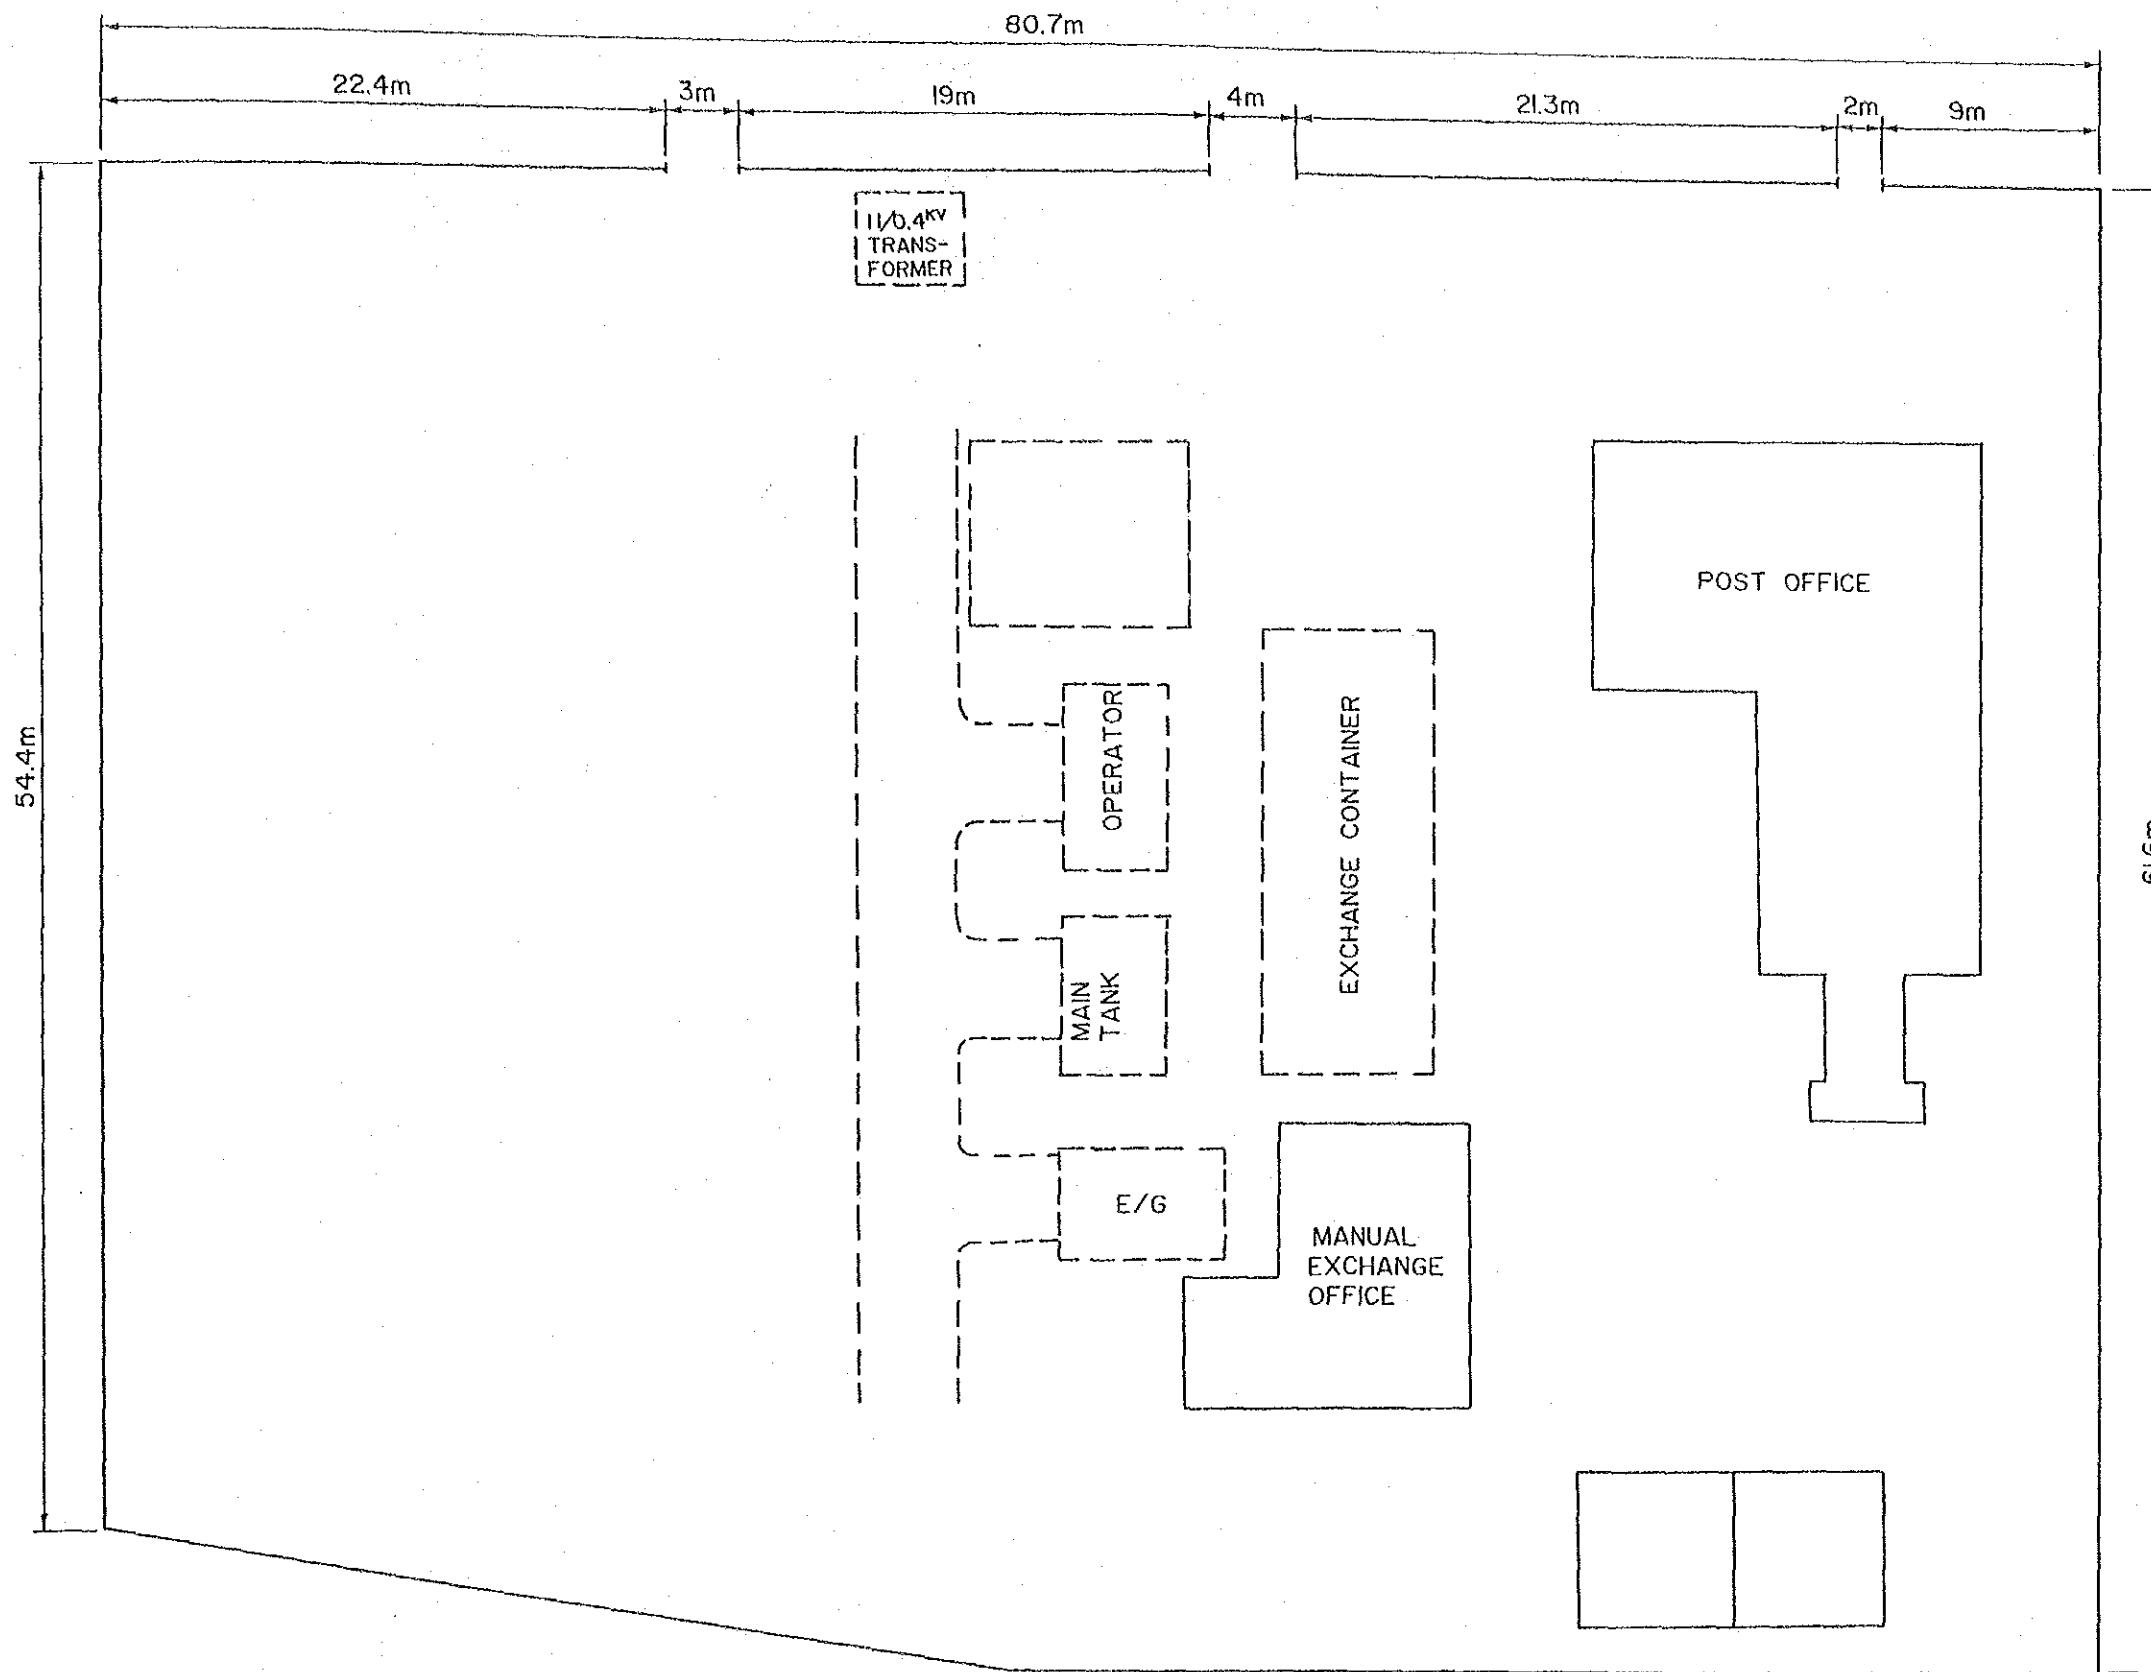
Site Layout Plan at Yenanyaung New Exchange Office
